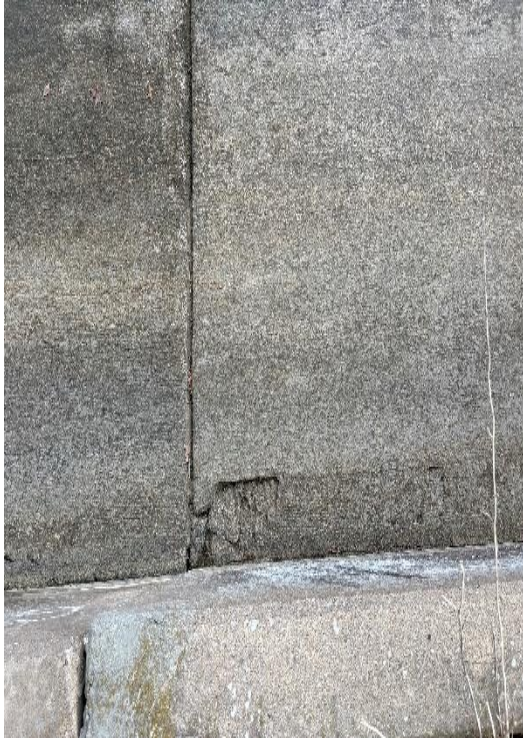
Spalling on West Spillway Wall Joint G
